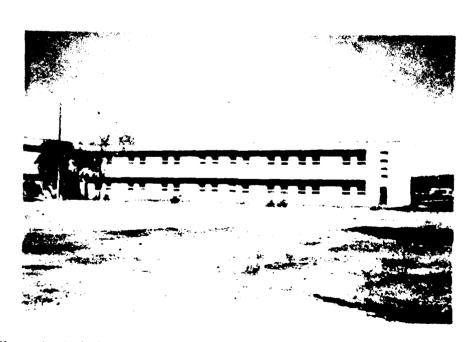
Building selected for PVC roofing at Dugway Proving Ground.
